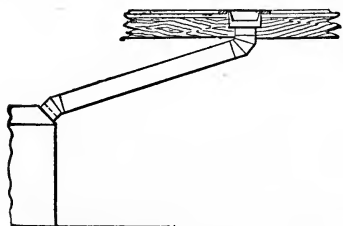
Cone Top Furnace and Pipe with Bevel Elbows.
